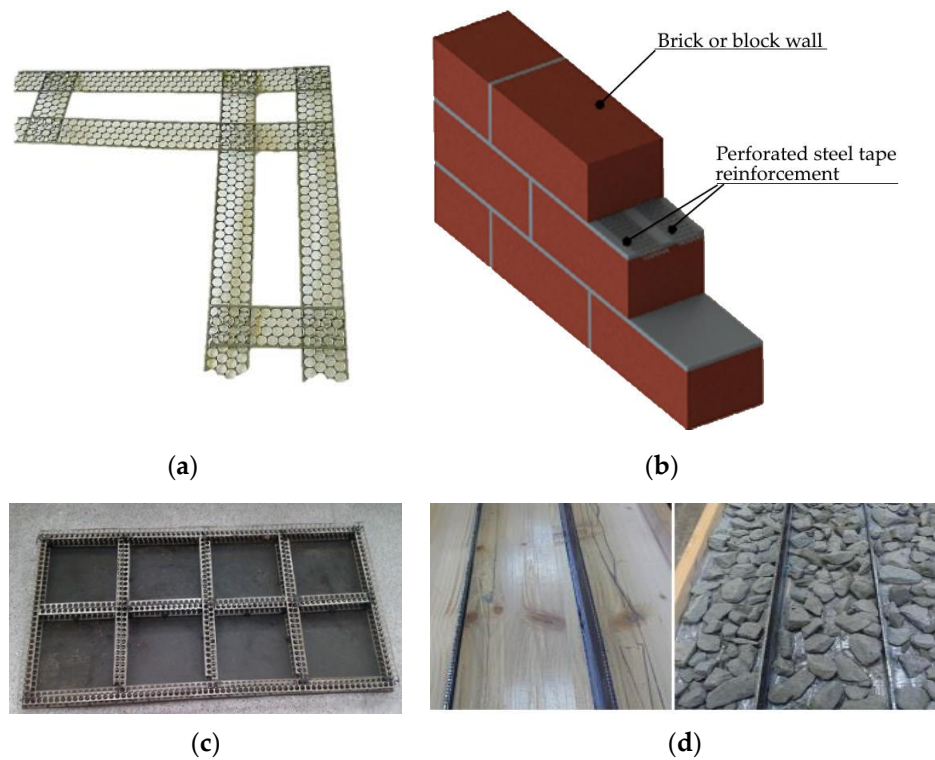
PMMs use different structural technologies: (a,b) PMM in masonry, (c) stiffeners in the mould members, (d) members providing timber-to-concrete connections in timber-concrete floor panels.
